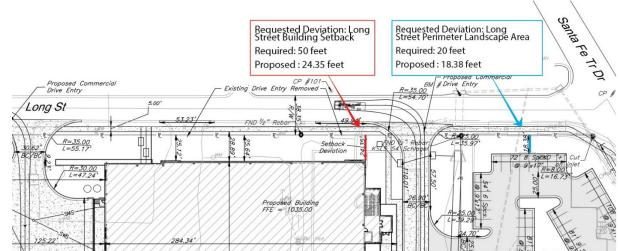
Long Street Building Setback and Perimeter Landscape Area Deviation Request.
